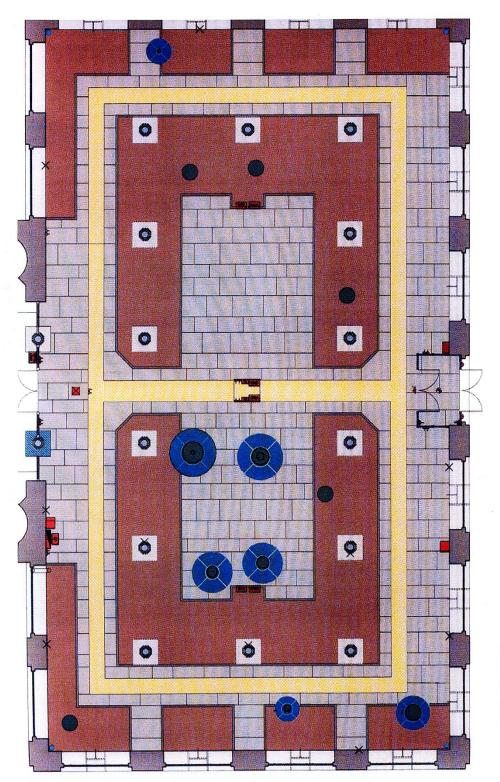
Plan showing redesigned interior of the Temperate Palm House. The yellow areas indicate underfloor heating ducts.
